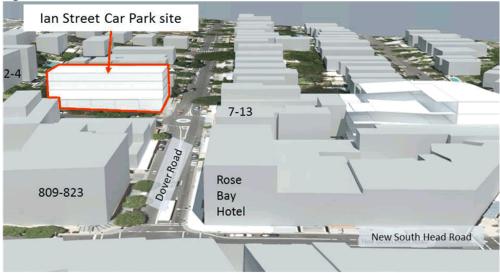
3D view of the Ian Street Car Park site facing south east showing the concept for the site compared to existing buildings in the Centre
